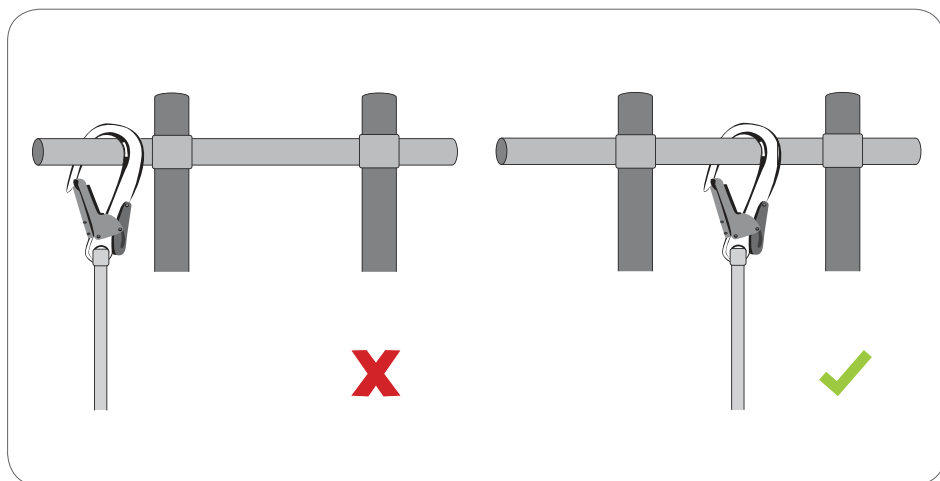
Fall prevention systems should not be connected to any open ended beams or cantilevers, as an initial fall arrest can cause the connection to slip off the open end of the beam or cantilever. Connections to beams and cantilevers should only be made between supports of which the structural strength has been determined and approved by a competent person.
